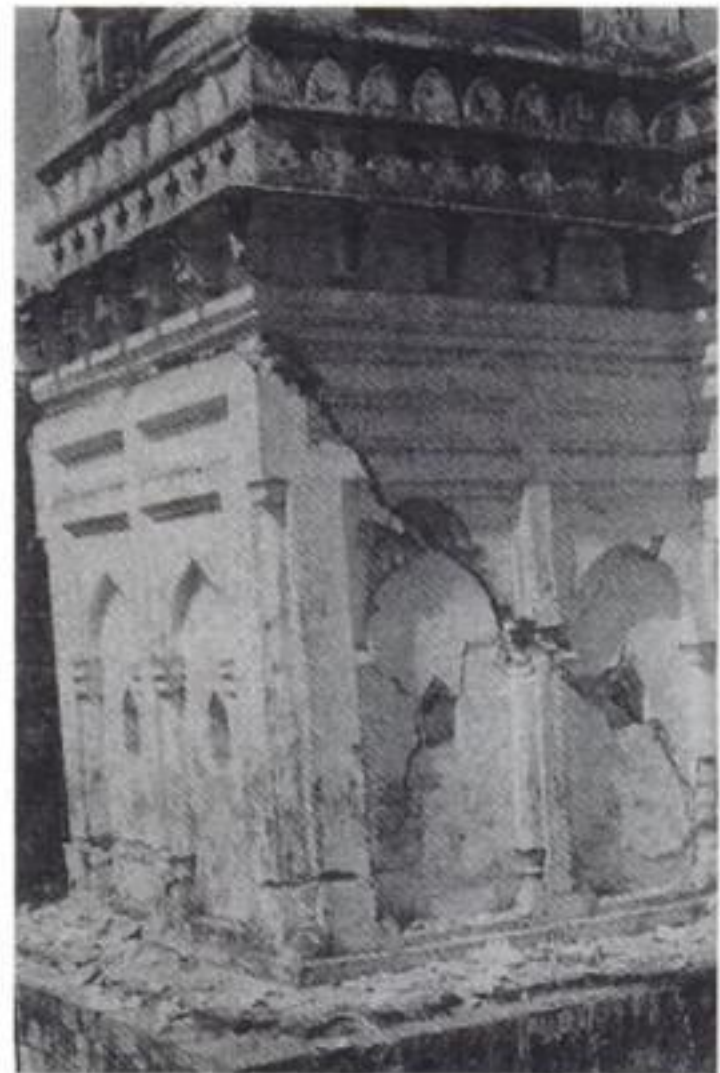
Development of shear cracks and partial collapse in Radha Krishna temple.
